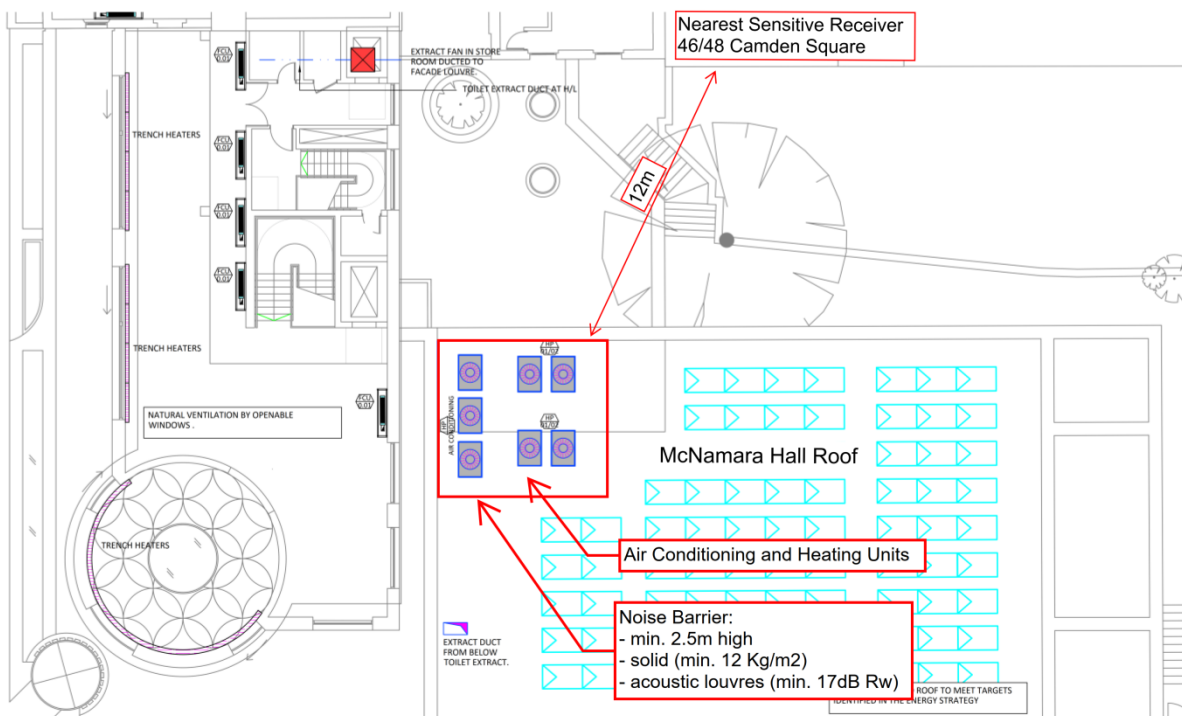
External plant equipment layout on Level 3 – roof of the McNamara Hall.
